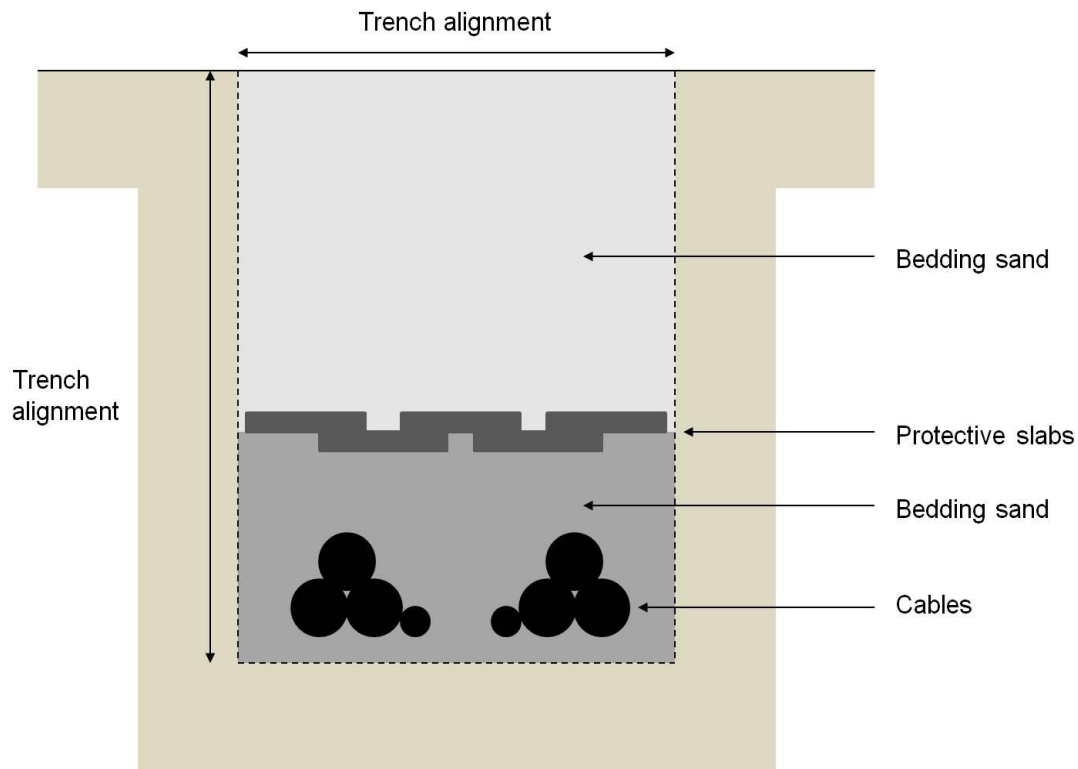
Example of a Typical Ausgrid 132kV Fluid Filled Cable Trench
